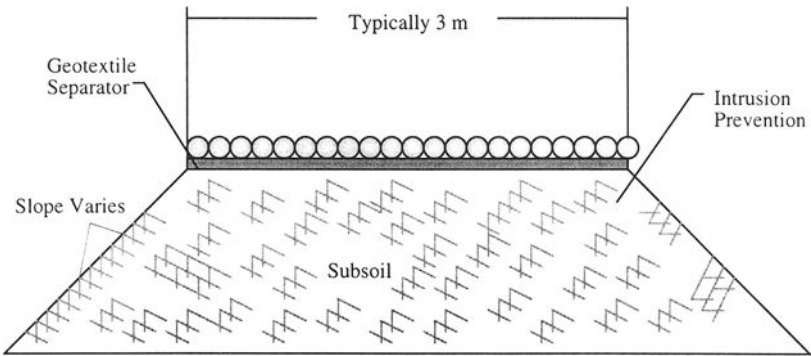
Typical Cross-Section of Geotextile Stabilized Area of the MKT Hike & Bike Trail.
